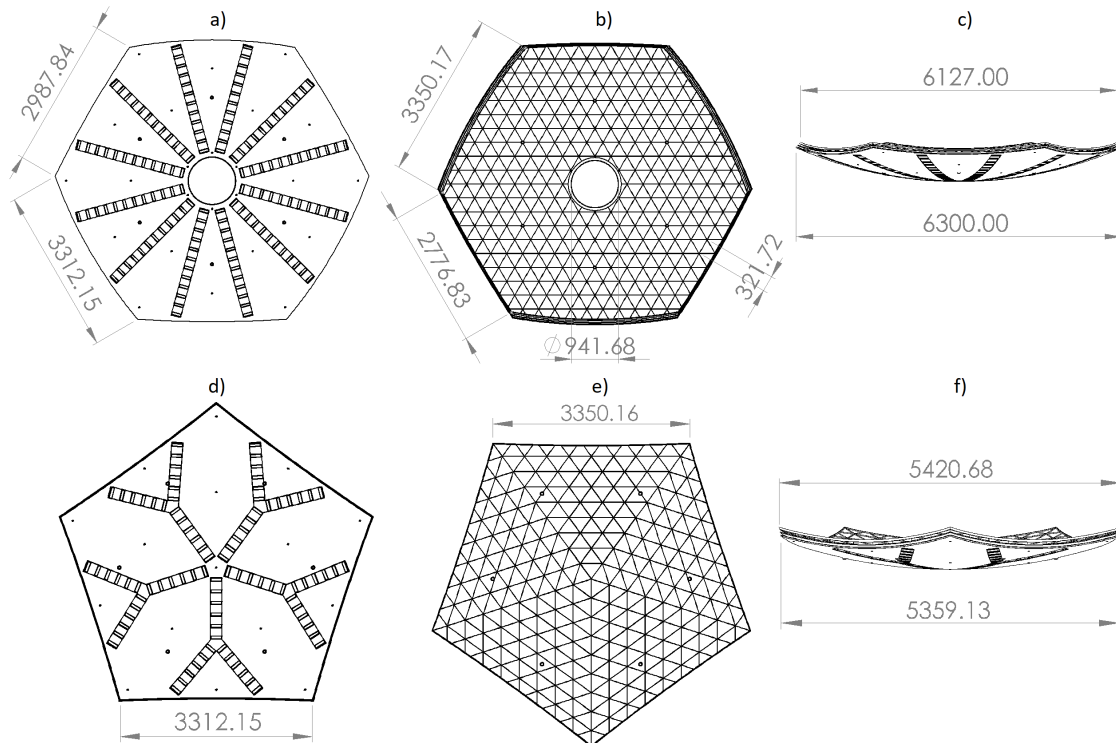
Drawings of the segments produced from the CAD models, dimensions in millimeters. Hexagon outer view (a), hexagon inside view (b), hexagon side view (c), pentagon outer view (d), pentagon inside view (e), pentagon side view (f).
